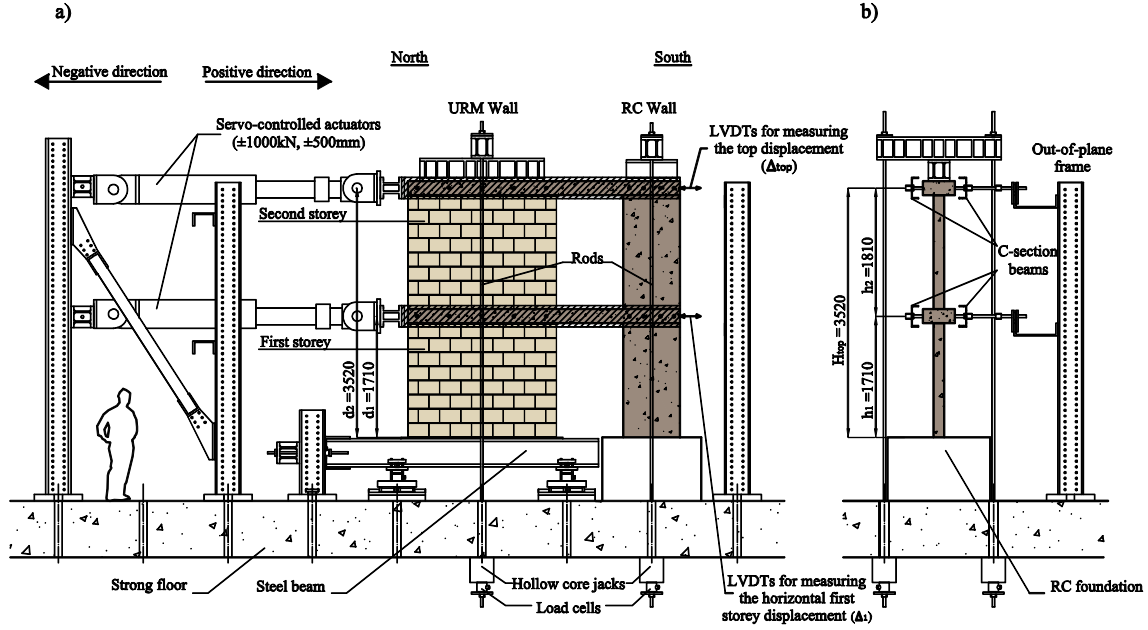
Test set-up: (a) front view, (b) side view; all dimensions in mm.
